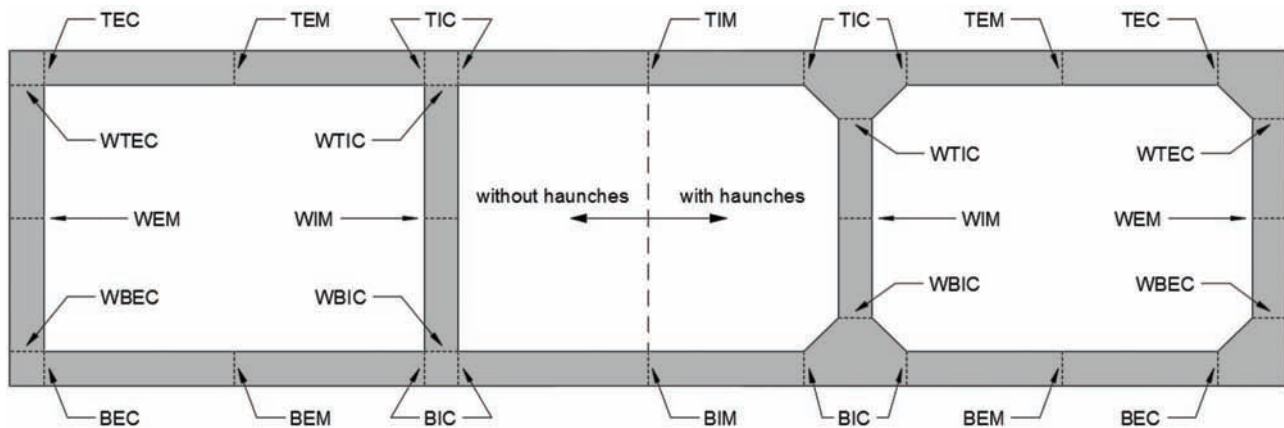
Moment critical sections for reinforced concrete box without haunches (left) and with haunches (right).
